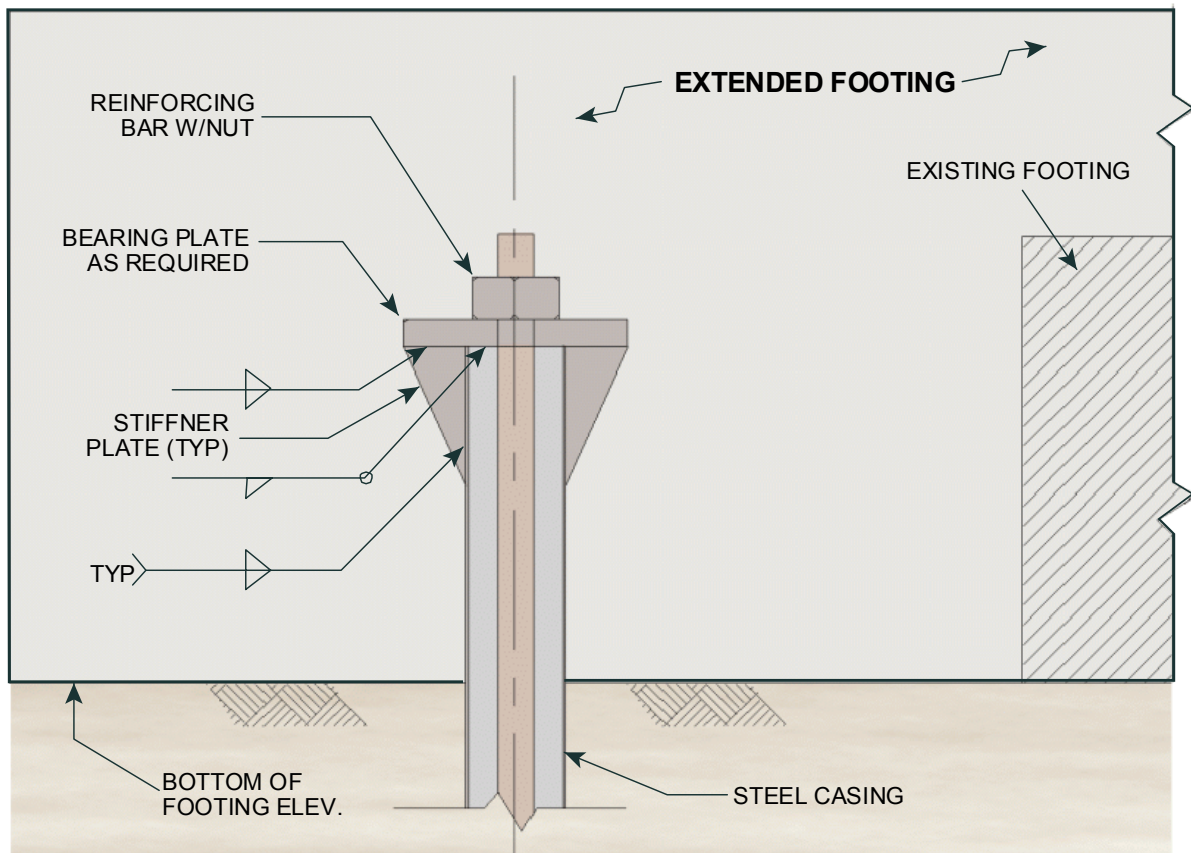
Pile to Footing Connection Detail (compression and tension loads).
